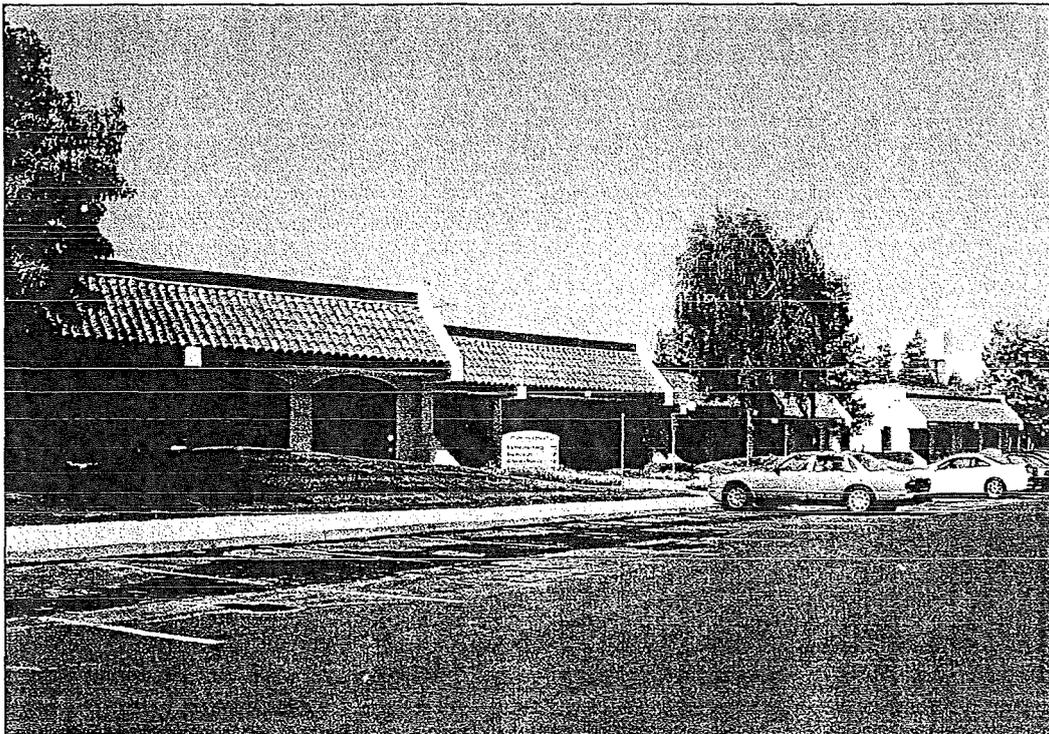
View of the project site, looking northwest from Old Bayshore Road.
